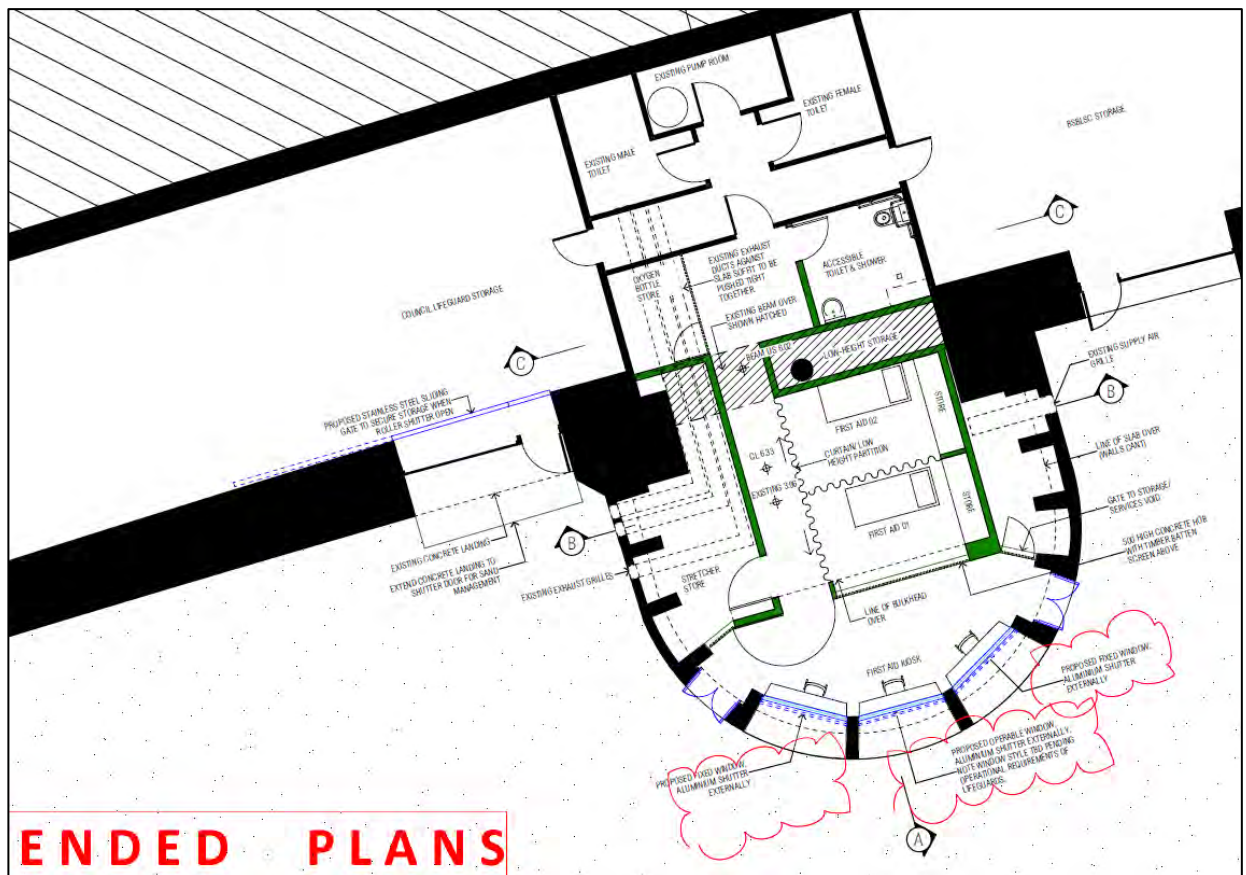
Approved plan of First Aid Facilities and Tunnel 3.
